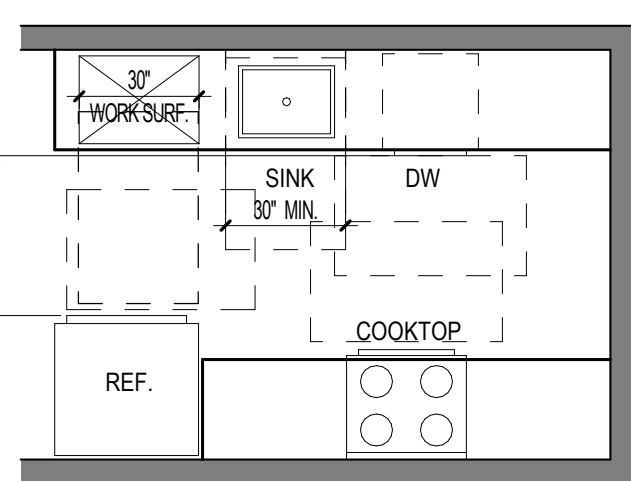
U-SHAPED KITCHEN CLEARANCE
